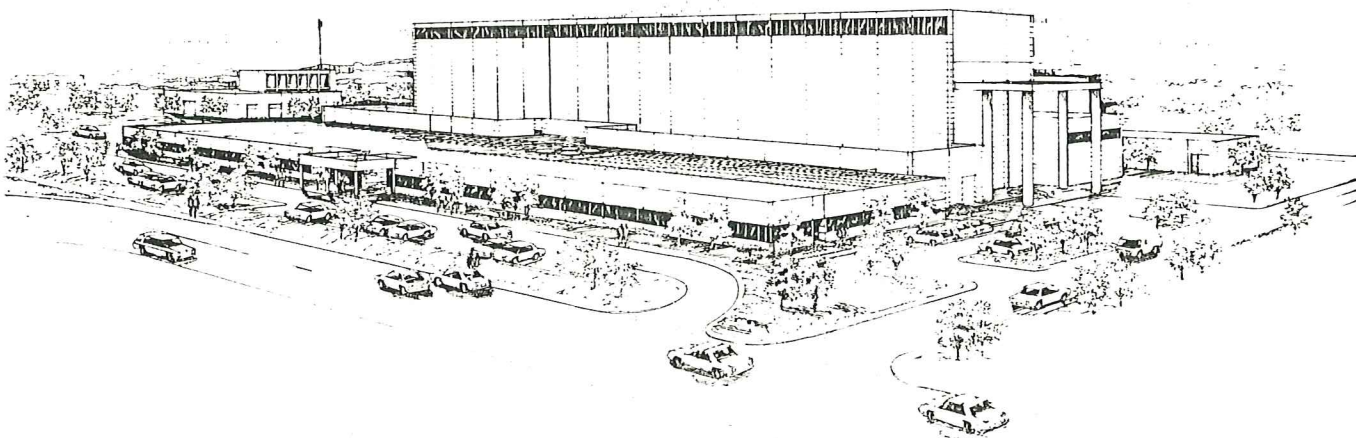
Architect's drawing of new CEM-UT laboratory facility
